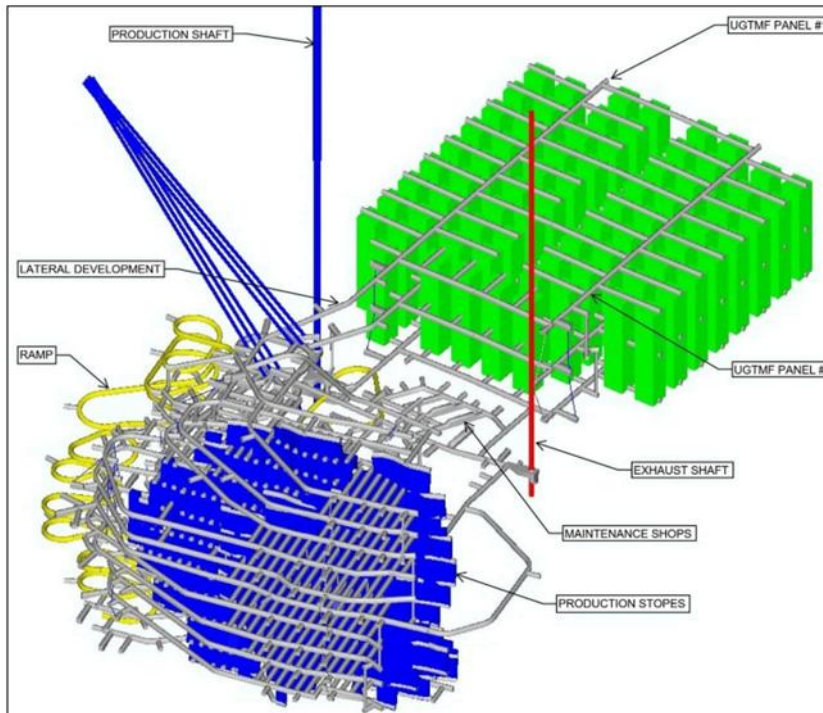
Overview of underground layout and infrastructure (source: NexGen Ground Freezing FEED Stage Design for NexGen Rook I Shaft Sinking)
